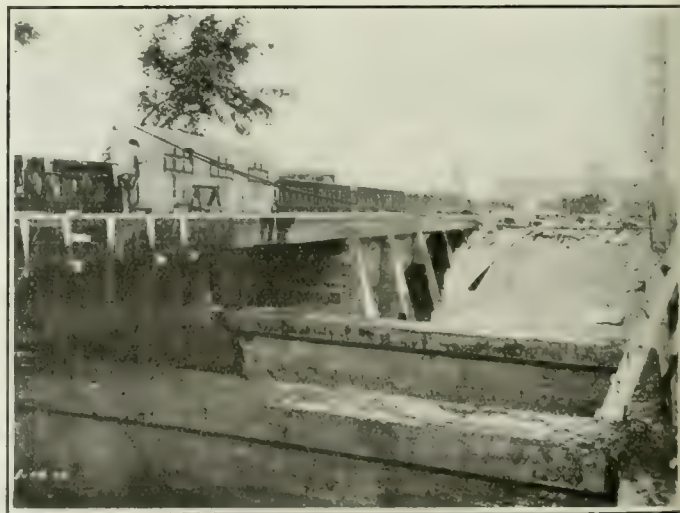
Construction of West half of bridge before fill placed, sidewalk spandrel walls and counterforts on left, tiwalls between approach walls at bottom.
